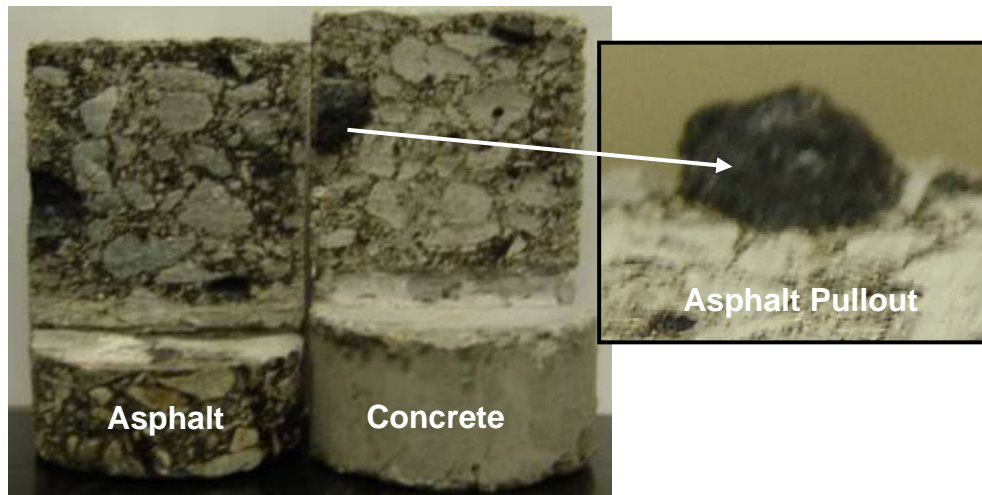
Postmortem Photograph of Failed Lap Joint Sample. Enlarged Surface View Shows Asphalt Pullouts on Concrete Surface
